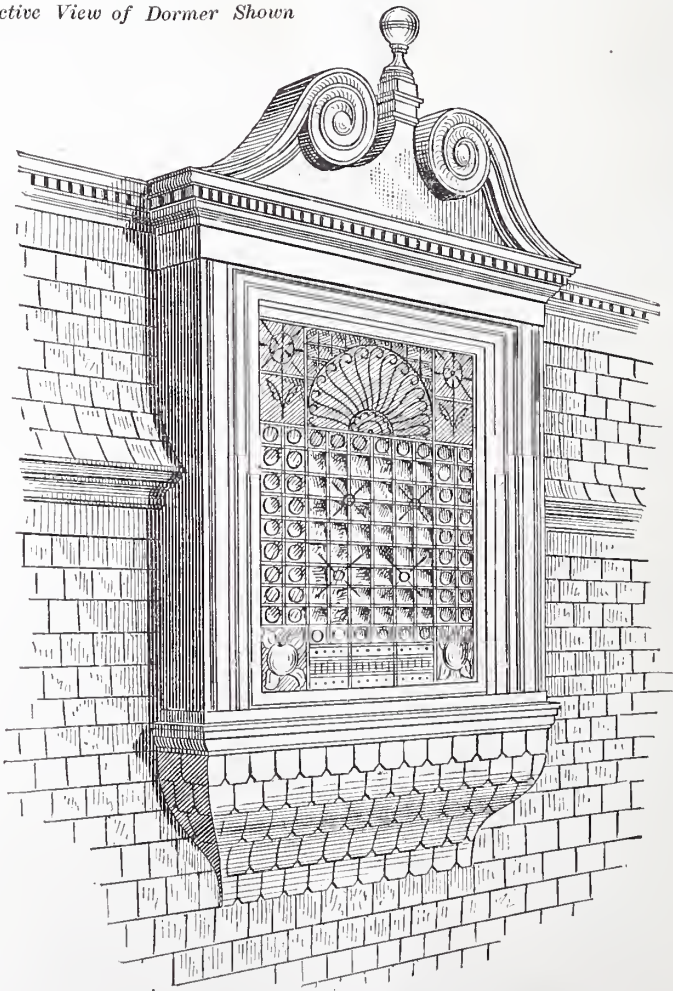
Window Lighting Staircase. (See Front Elevation.)
